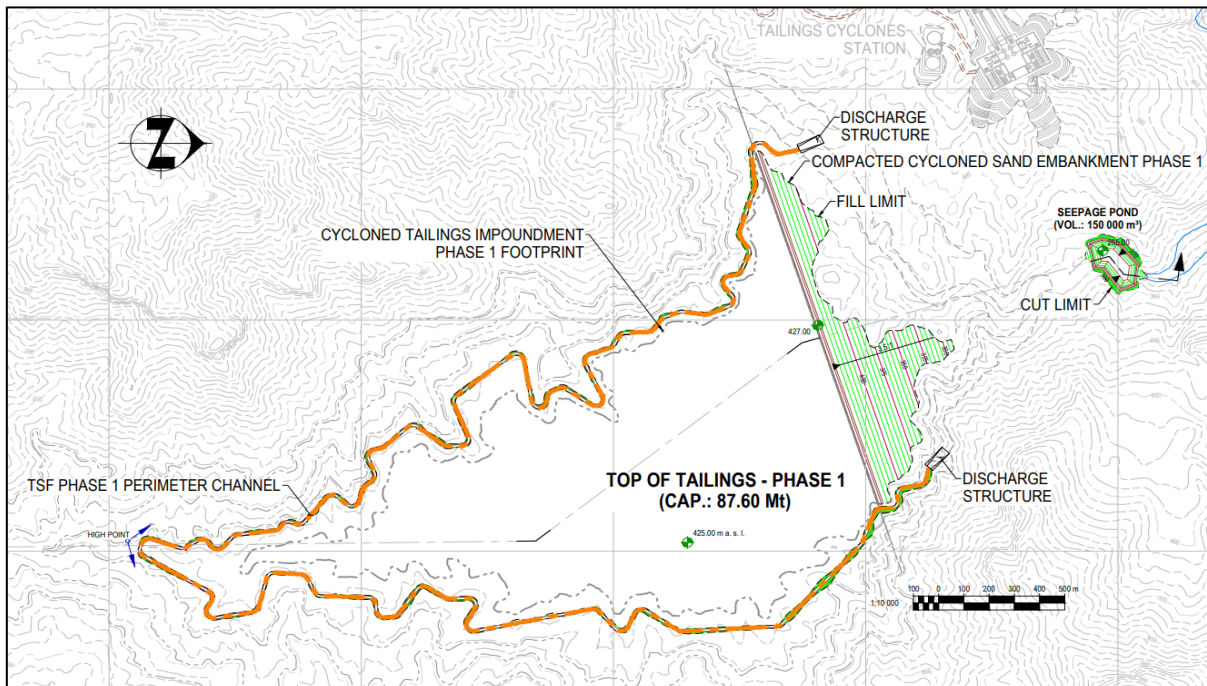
Tailings Storage Facility Arrangement Year 1 (Starter Embankment)
